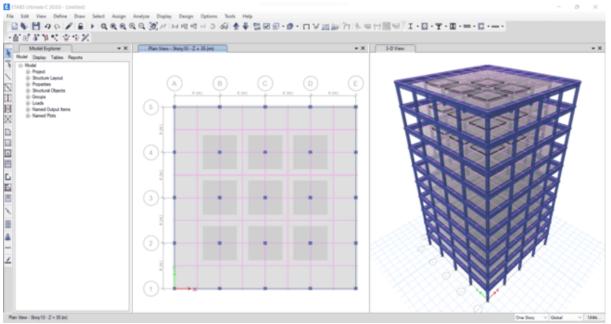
G+10 Structure with Flat Slab and Staggered Beam
